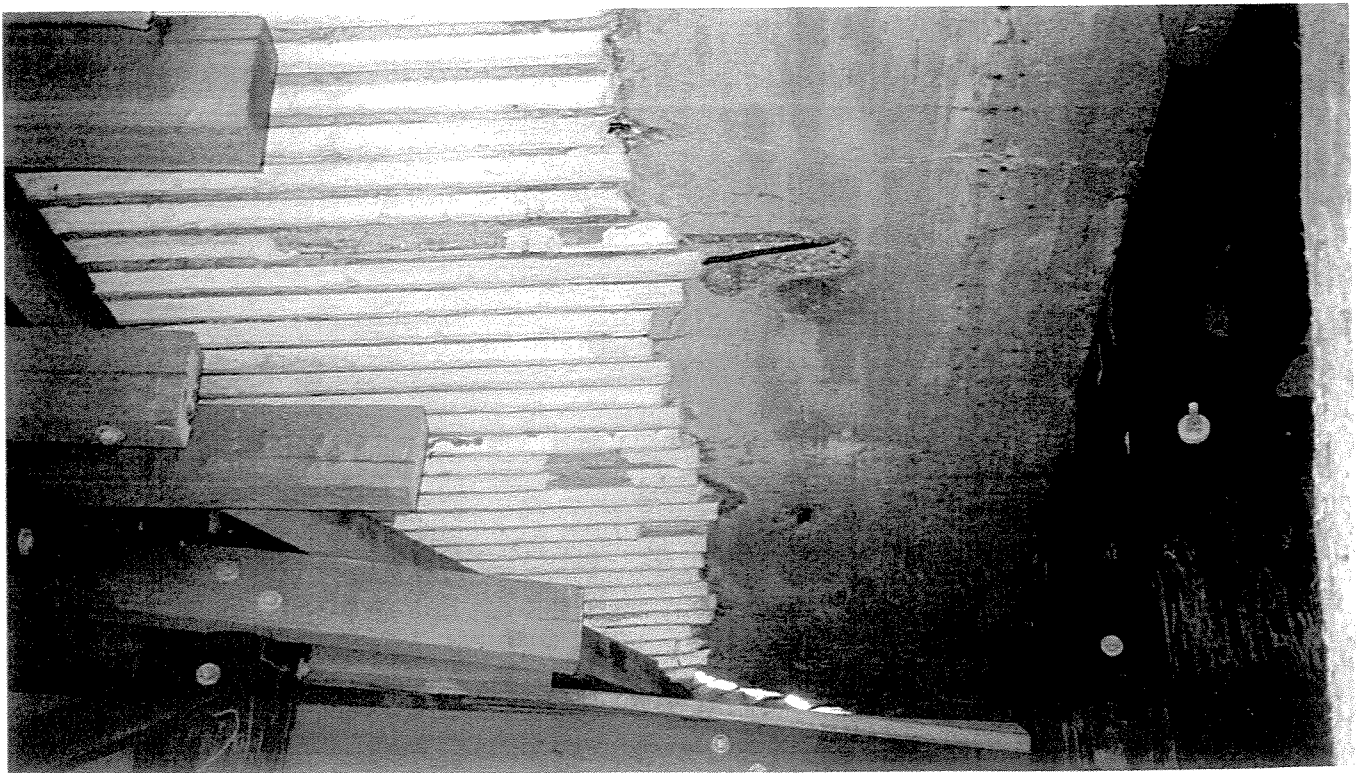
Between pile bents 79 & 78, north side of pier. East side (left) formed with steel corrugated metal decking (gone). Note, deck flutes were packed with a foam filler still in place. West side (right) typical cast in place concrete deck with a few small spalls with exposed steel reinforcing, looking south.
